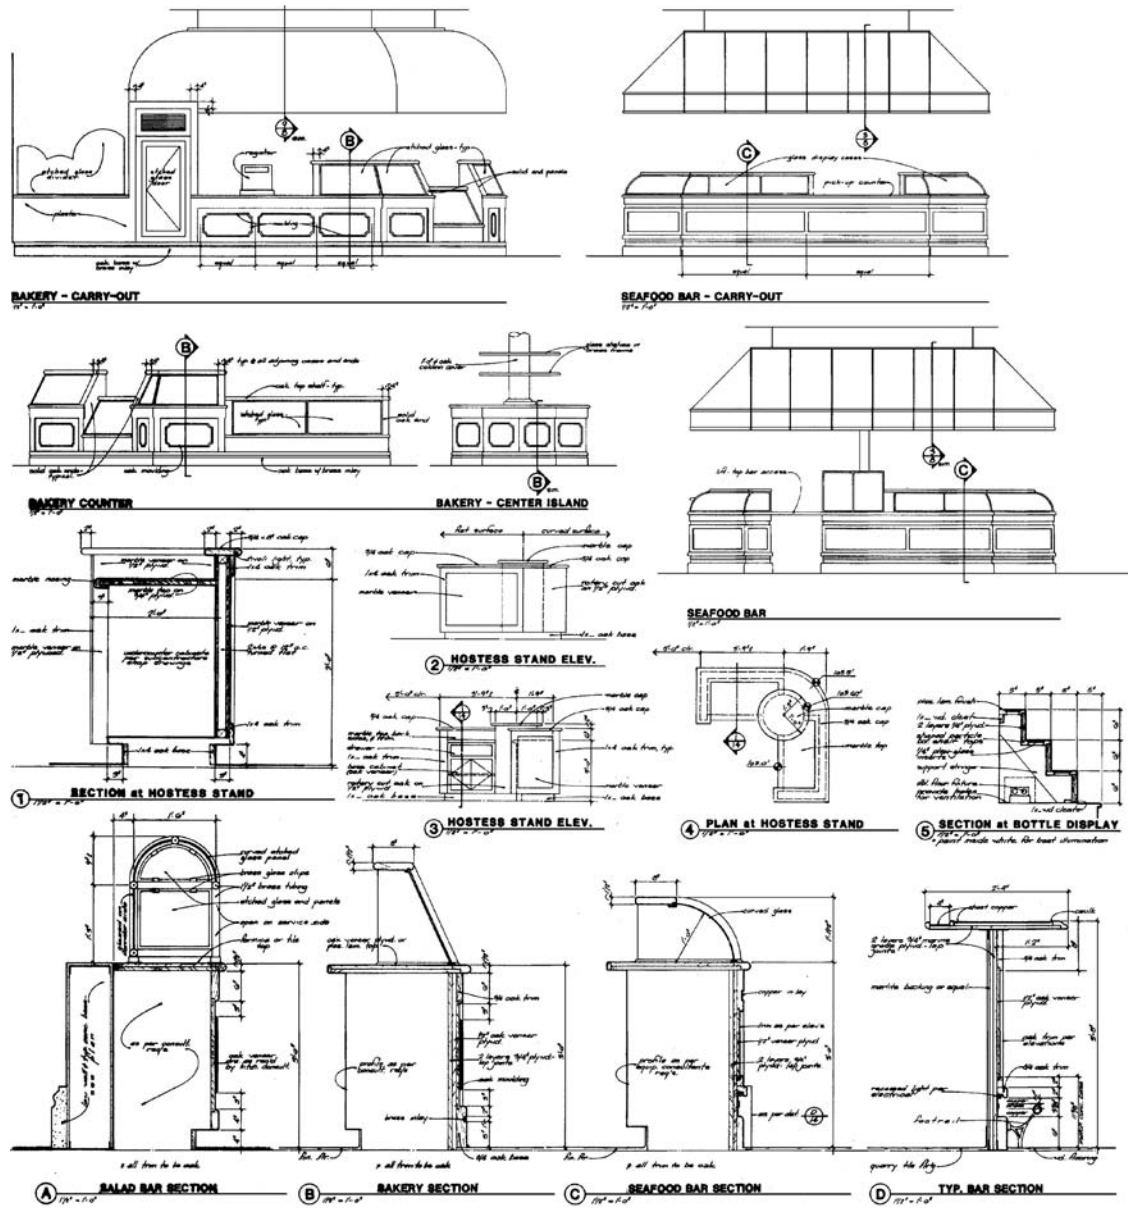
Example of construction drawings to explain the details needed for construction.
